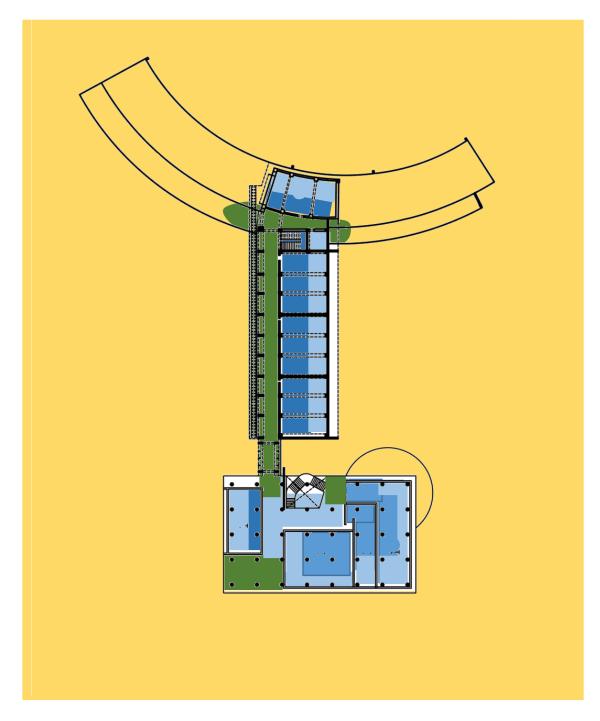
Upper Floor Plan; Prospect and Refuge
